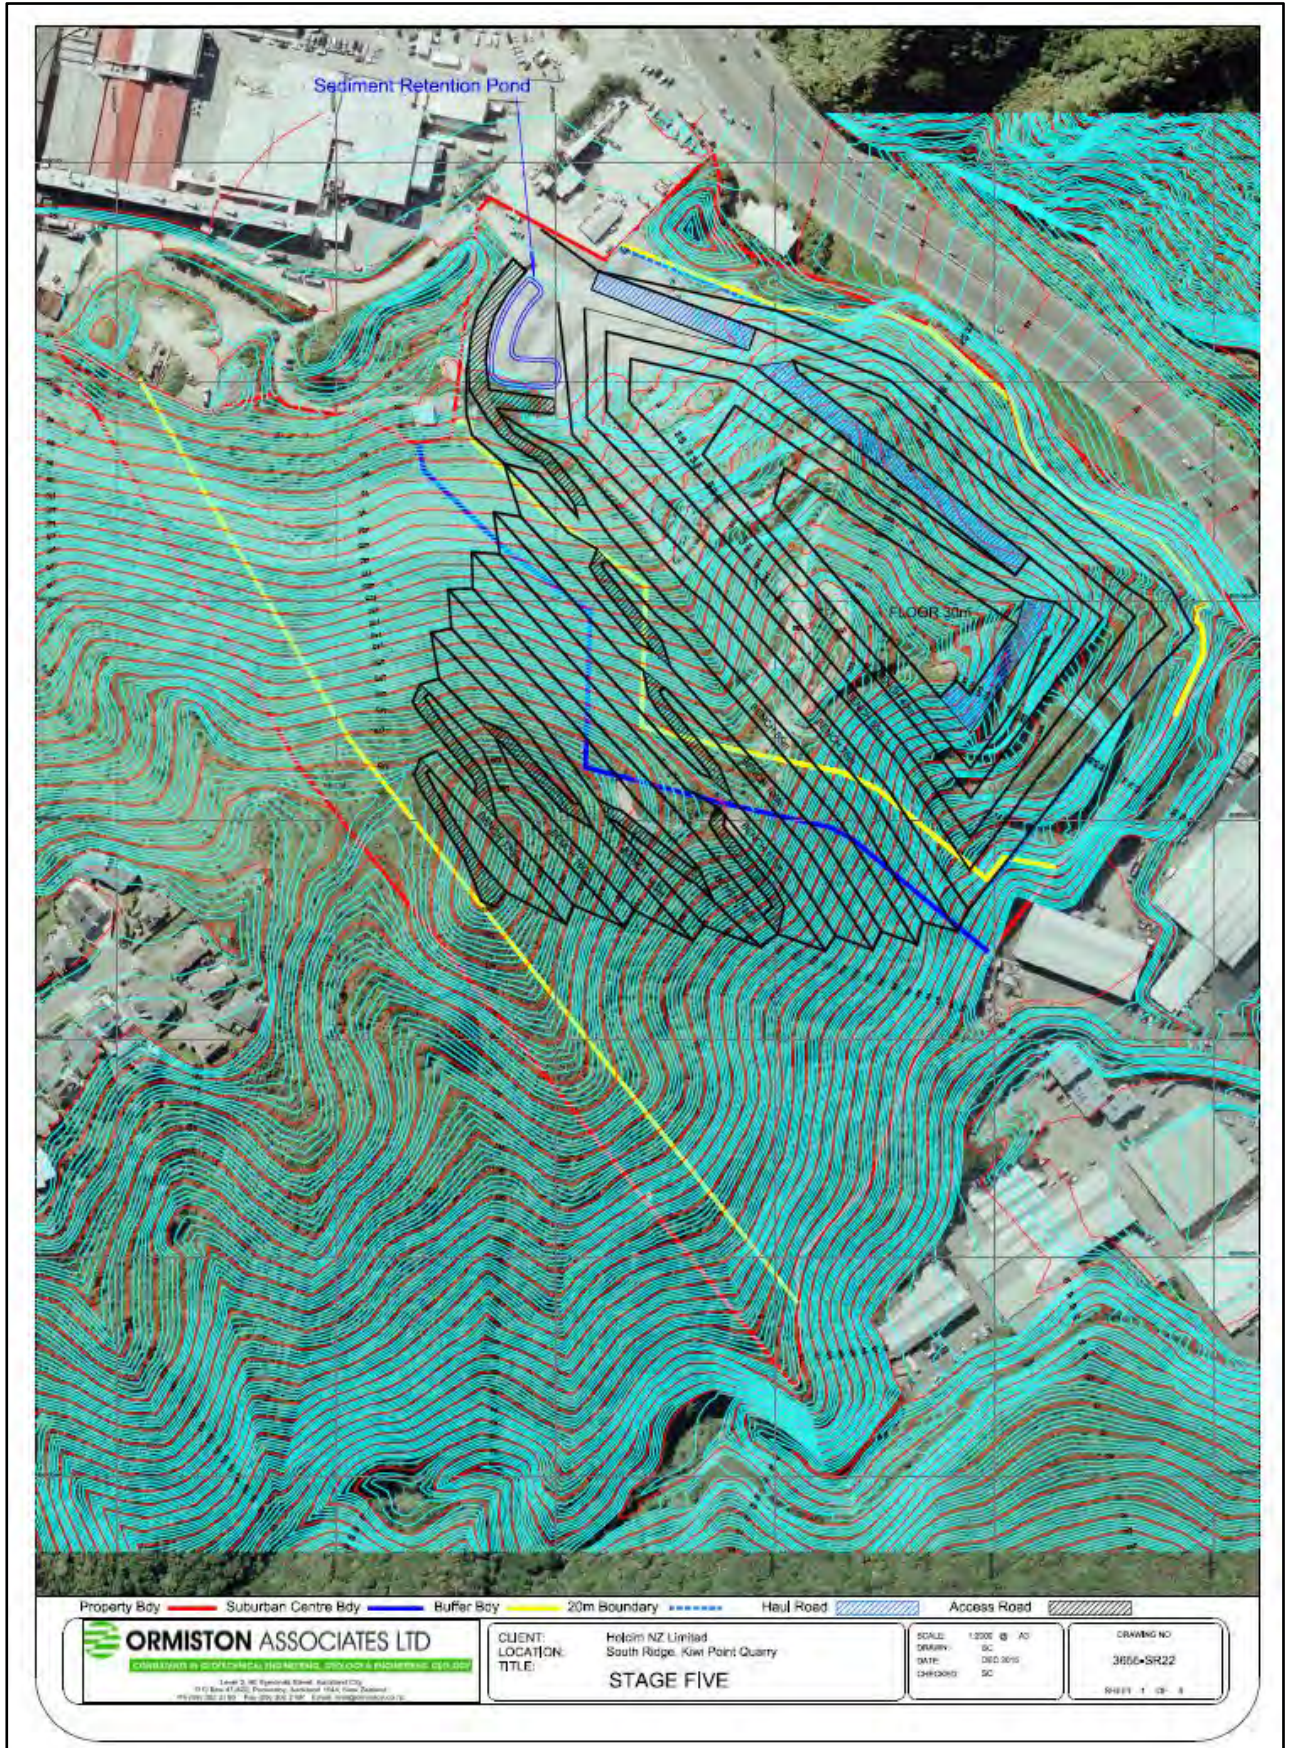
Site Layout Plan Showing the Option 3 Quarry Extension at Stage 5
